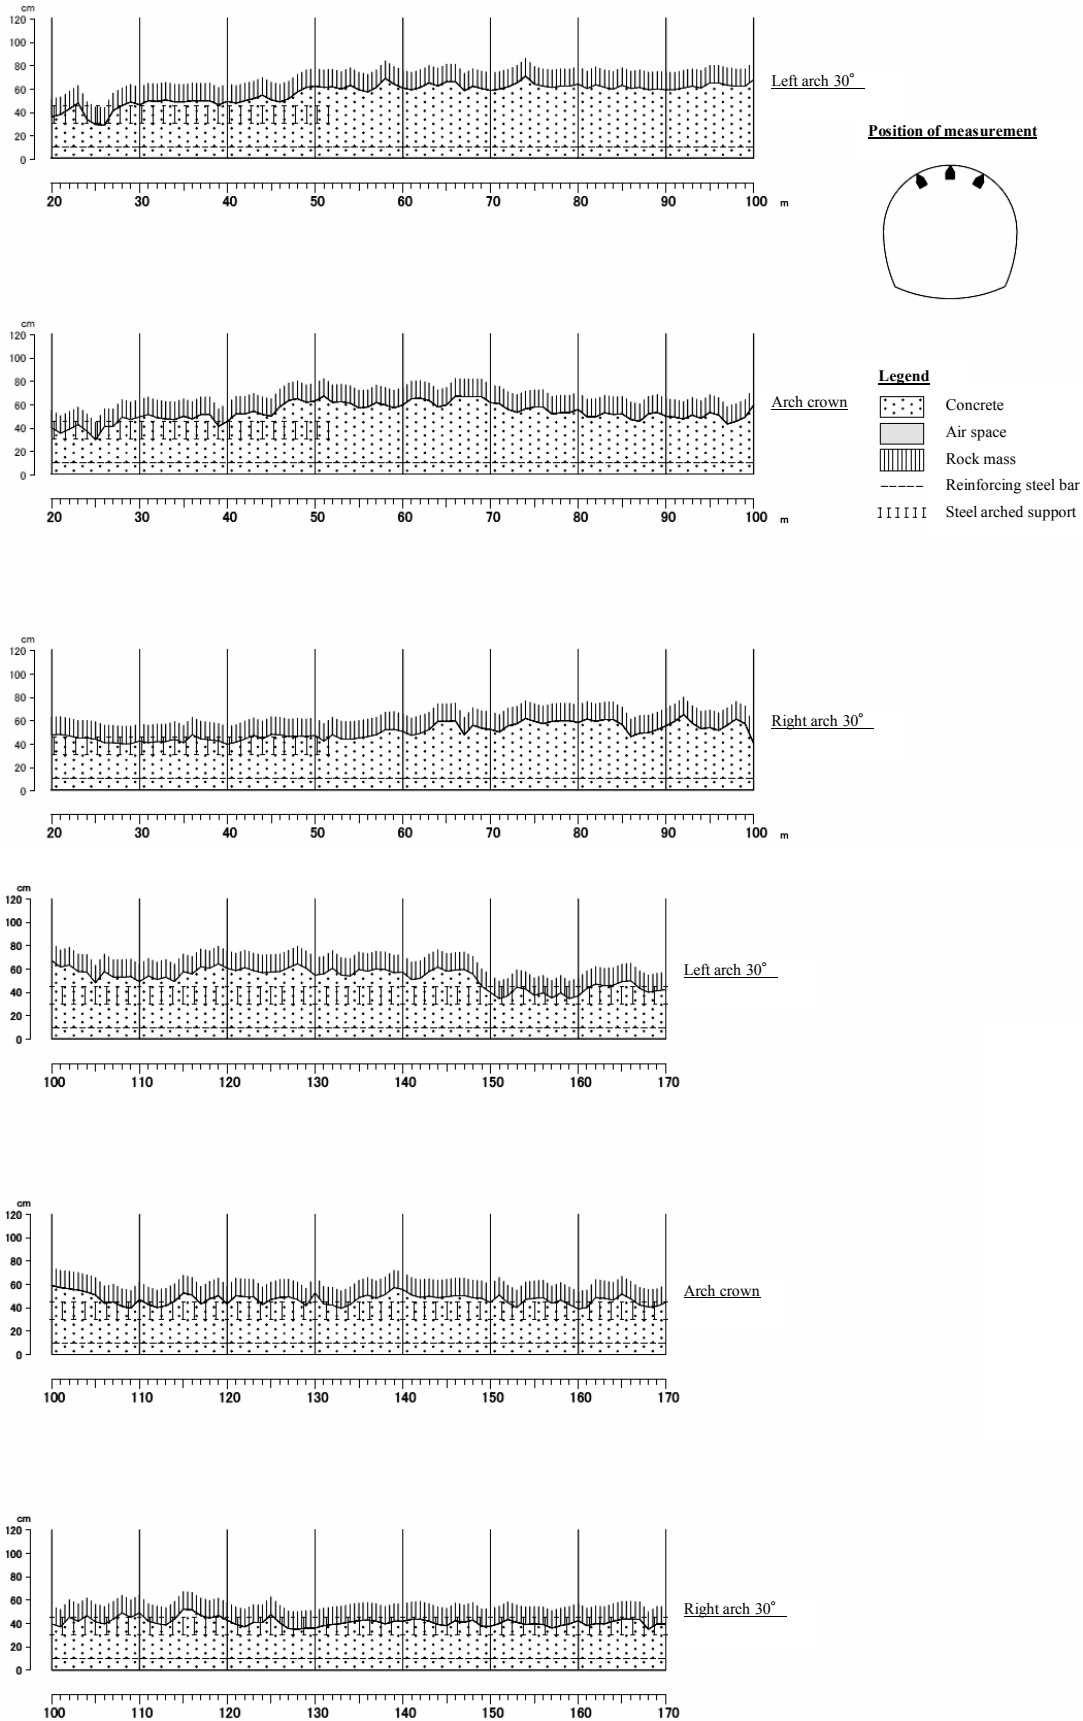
Investigation of Cavity behind Concrete in New Tunnel (1)
